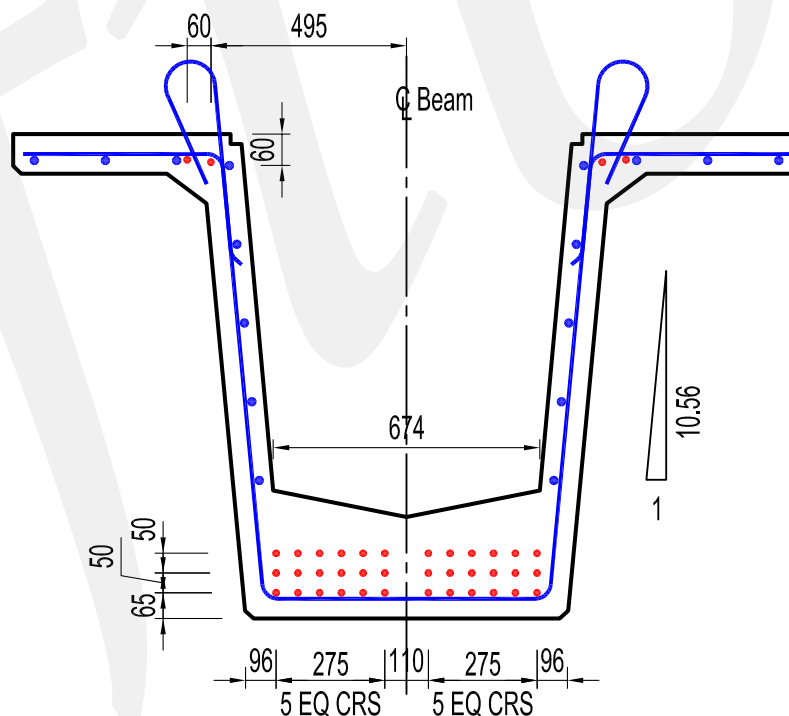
Cross section of precast concrete Super T girder showing typical reinforcement and strand locations.
